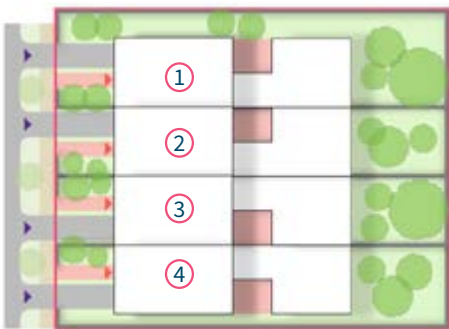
Terraces with individual parking from street. Individual parking from street can be appropriate on terraces with wide street frontages where dominance of garages on the frontage can be avoided. The site layout creates high amenity backyards for all dwellings.
